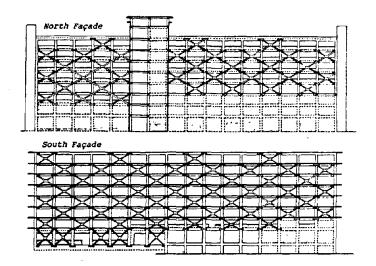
Arrangement of cross braces on North and South facades of the Tohoku Institute of Technology in Sendai, Japan [3.2].
